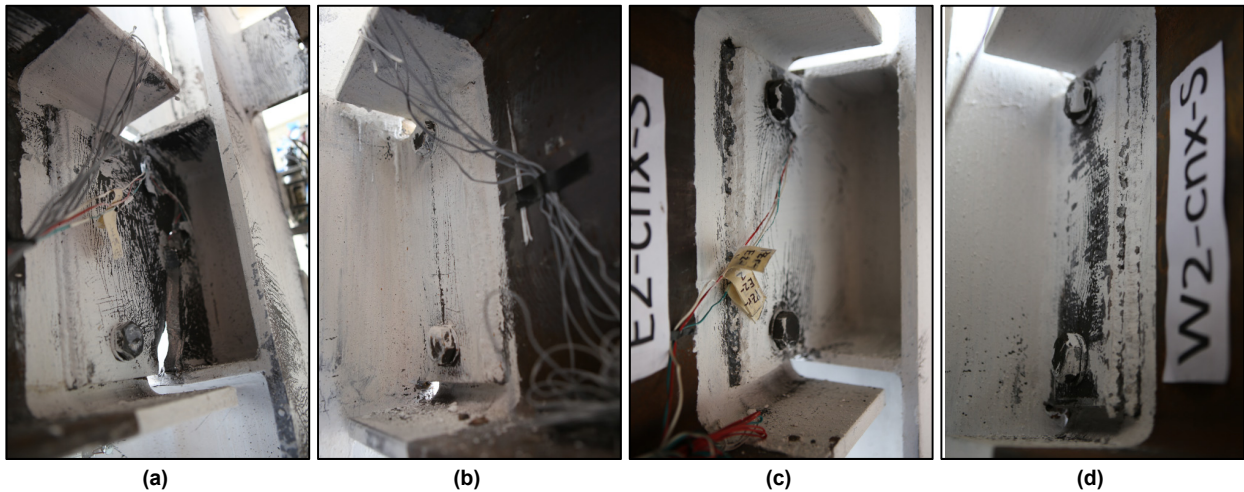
Damage to the first-floor shear tabs (south face) at: (a) the east gusset and (b) west gusset; and damage to second-floor shear tabs (south face) at (c) the east gusset and (d) west gusset.
